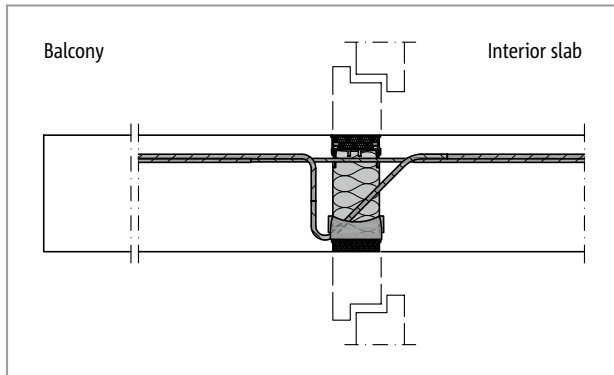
Schöck Isokorb® T Type CK: Balcony with window wall system
